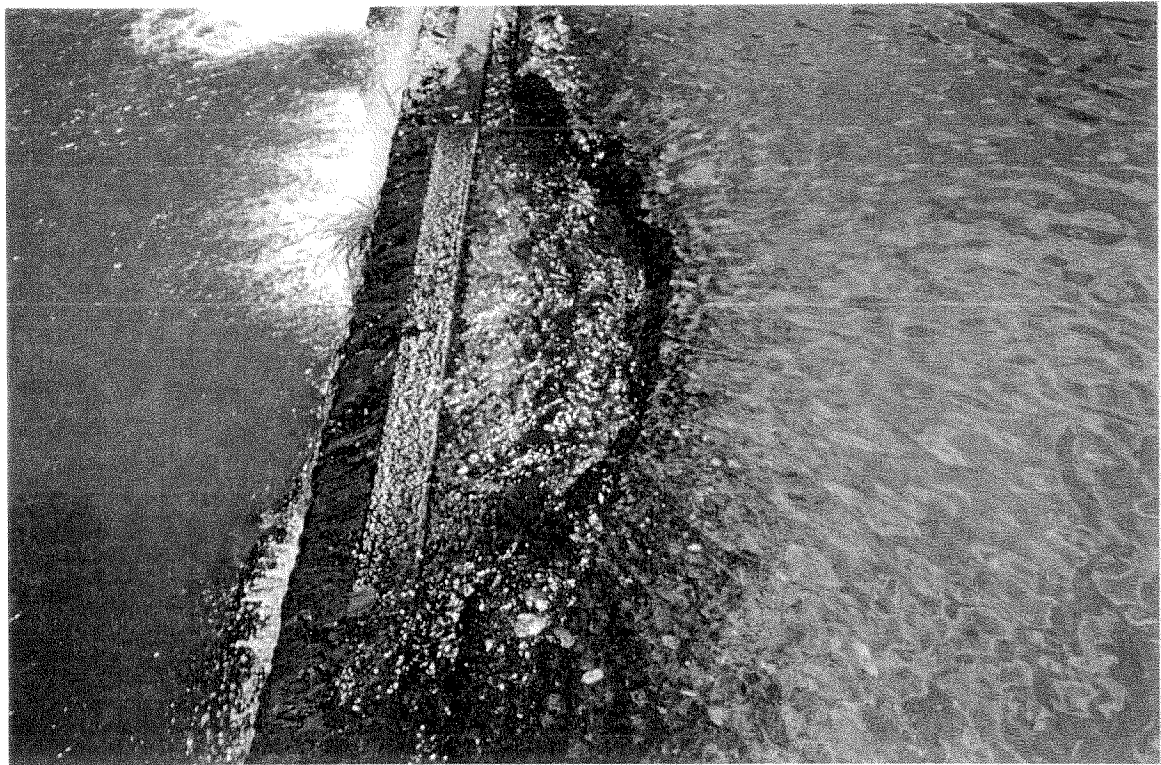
Close up view of the dam near the left abutment. Note the concrete repair work and the water flowing out of open cracks on the downstream face.
